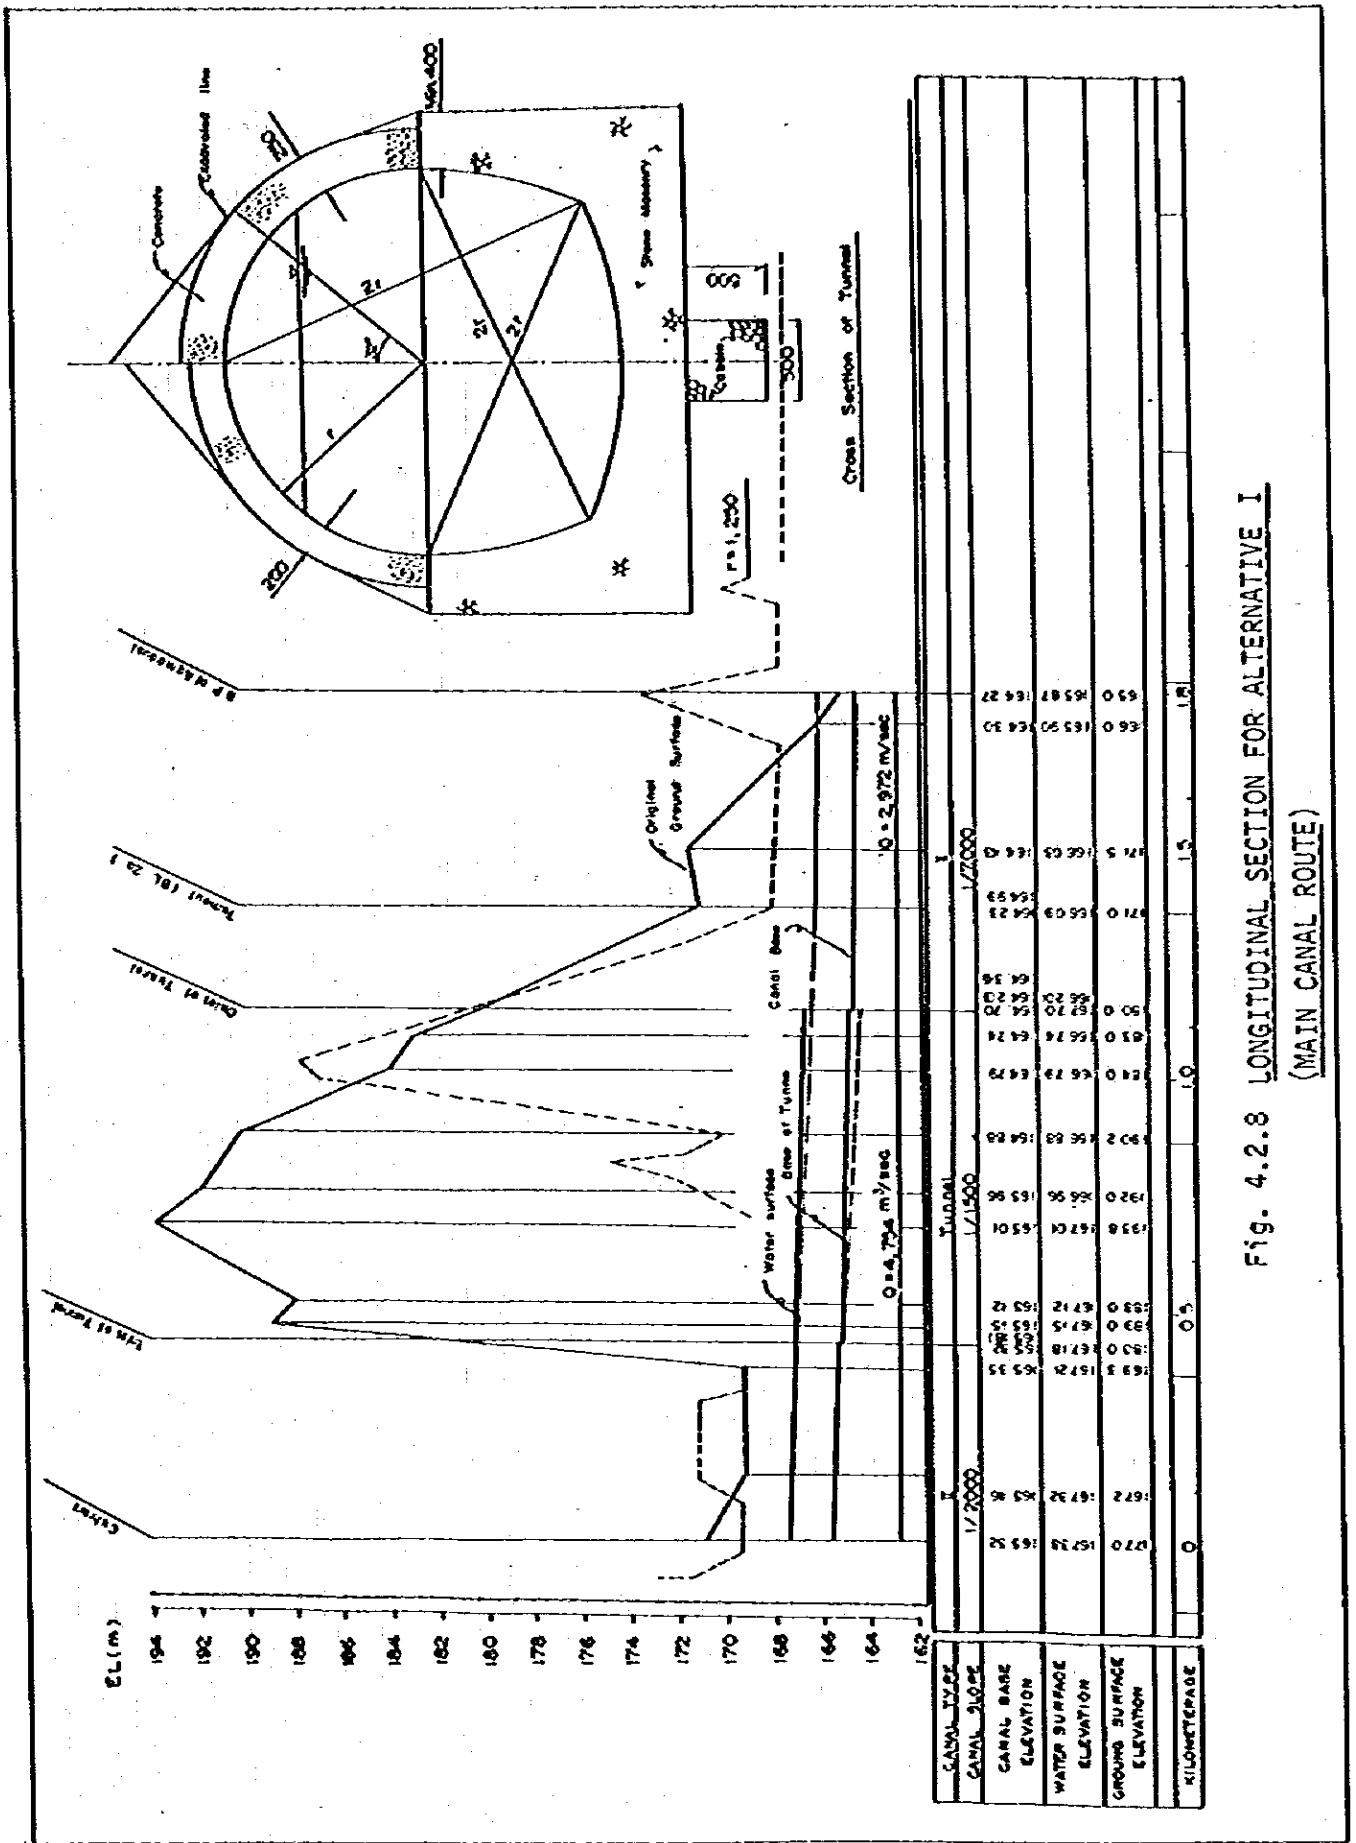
LONGITUDINAL SECTION FOR ALTERNATIVE I
